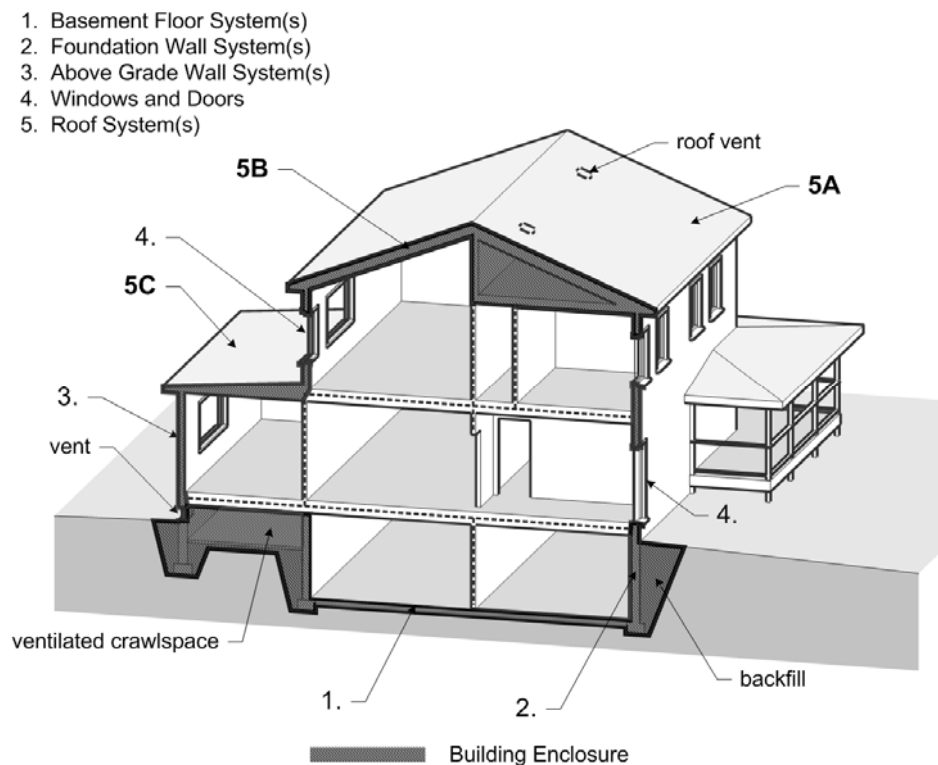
Typical building enclosure elements (adapted from Straube & Burnett 2005)
